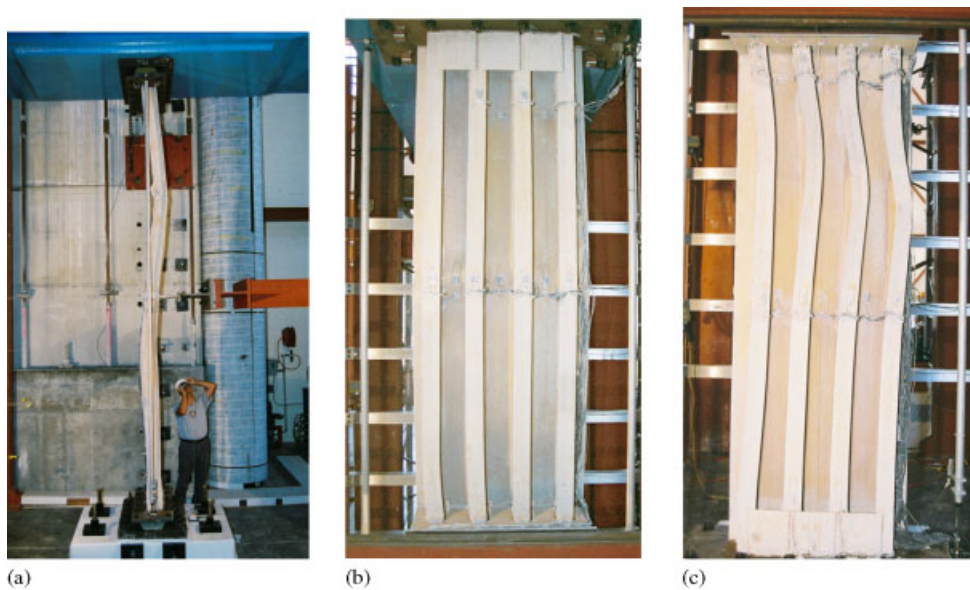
Deformed configurations after testing (Deck Specimen 2): (a) overall view; (b) upper panel; and (c) lower panel.
